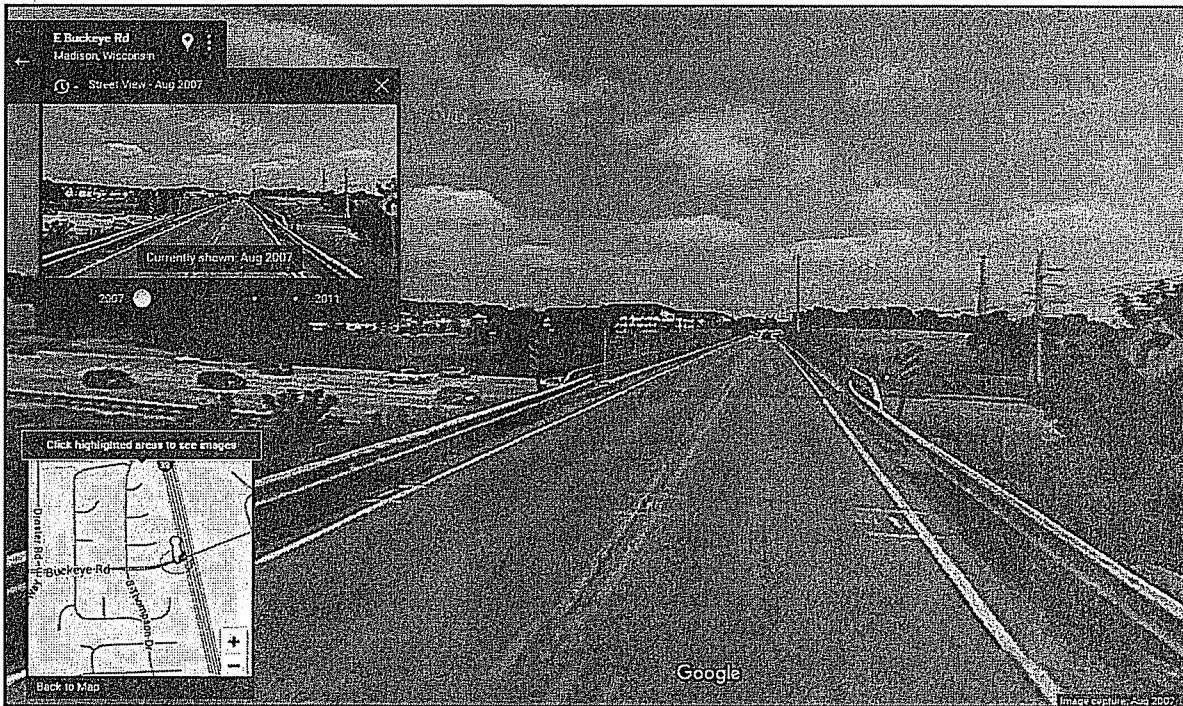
Google Streetview image looking east towards Richmond Hill neighborhood, across the East Buckeye Road bridge in August of 2007 – prior to its reconstruction with pedestrian or bike facilities.
